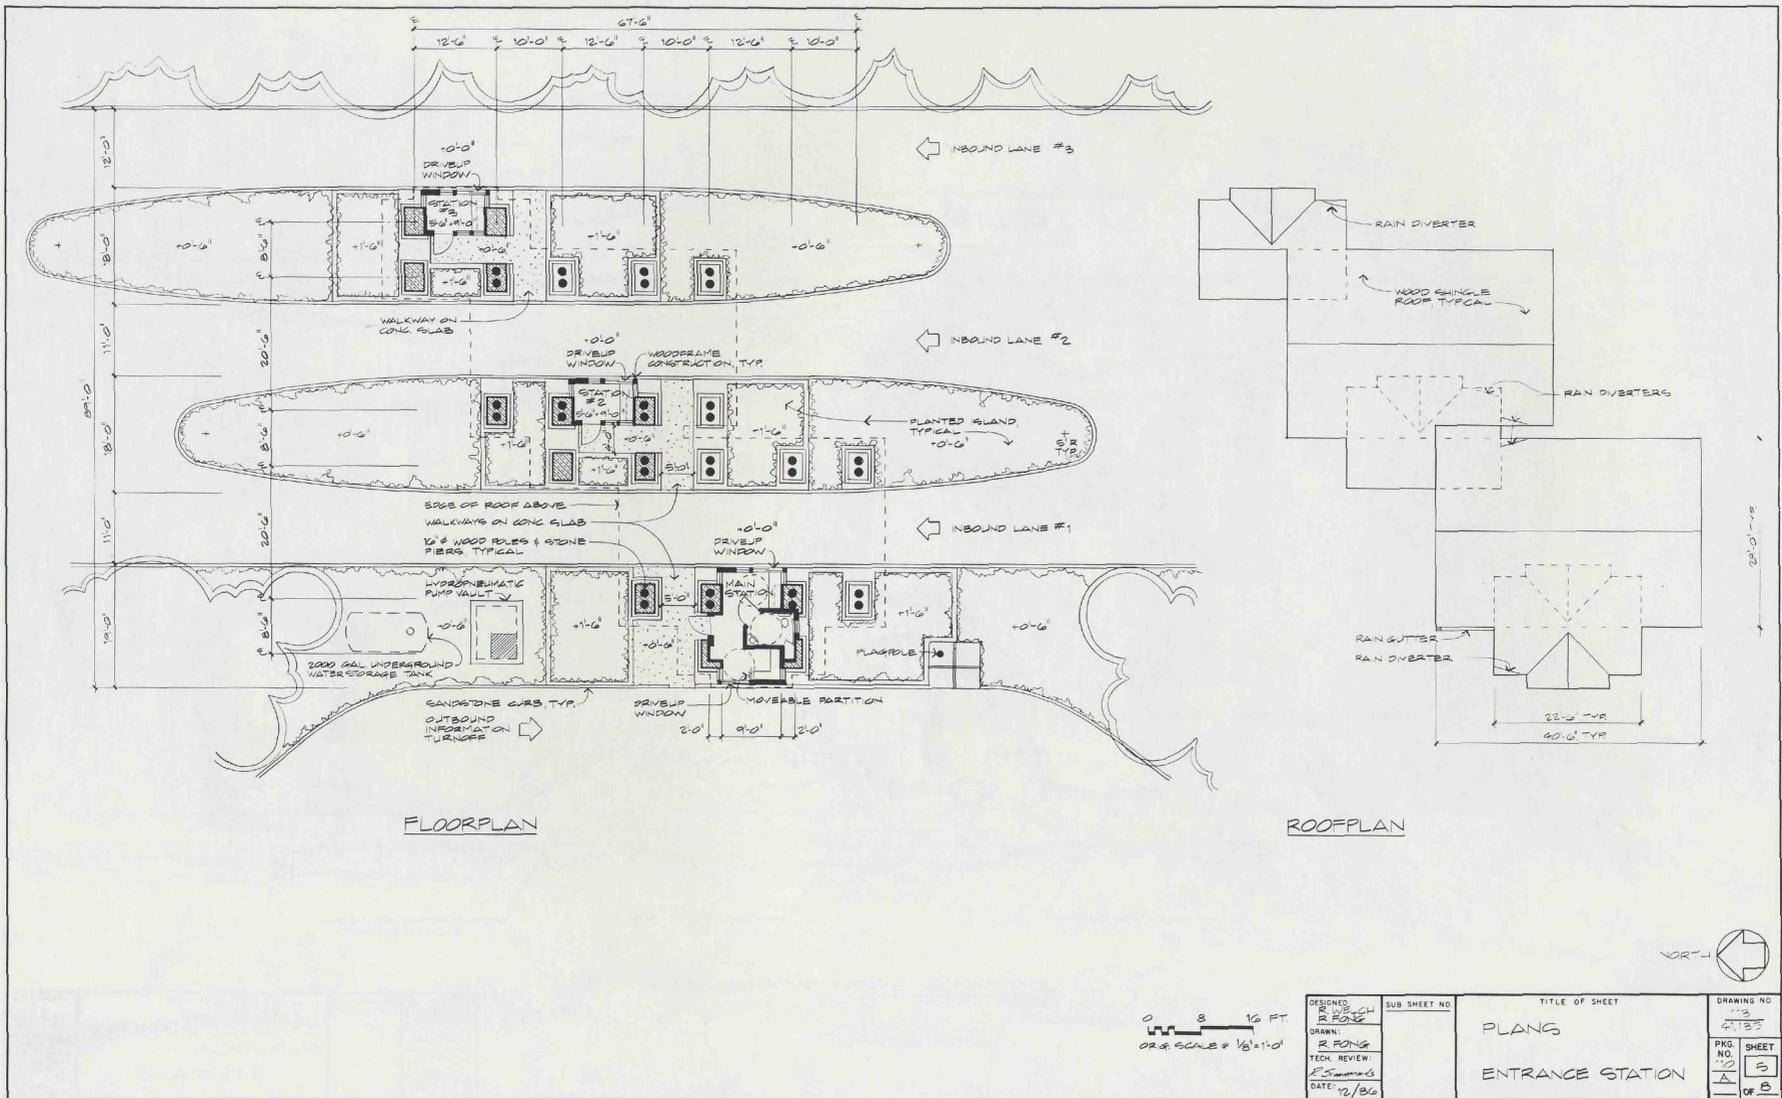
Floor Plan, Proposed South Rim Entrance Station, Grand Canyon National Park
